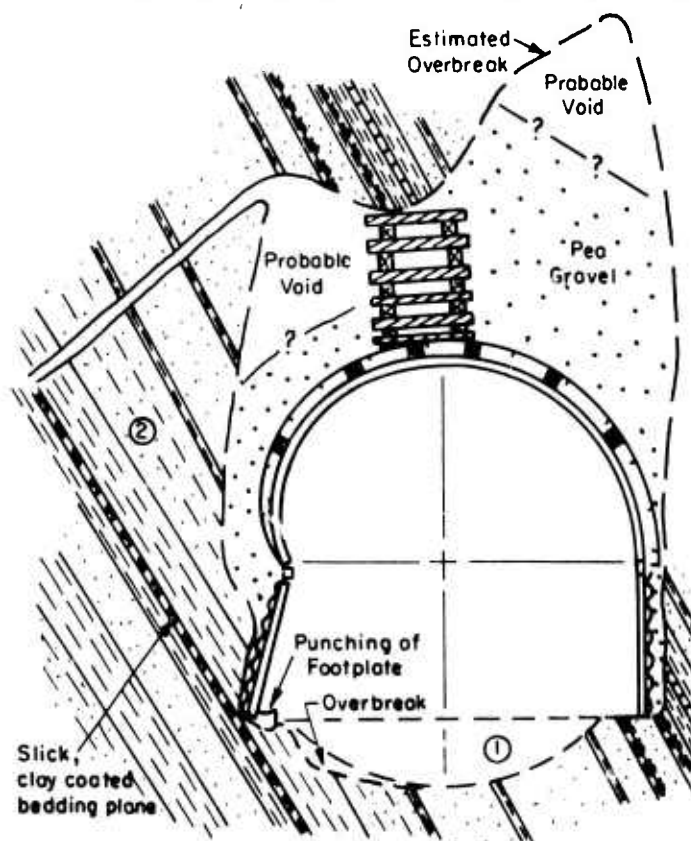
D PARTIAL COLLAPSE AND BLOCK SLIDING - CASTAIC DIVERSION TUNNEL. (after Arnold et al., 1972)
